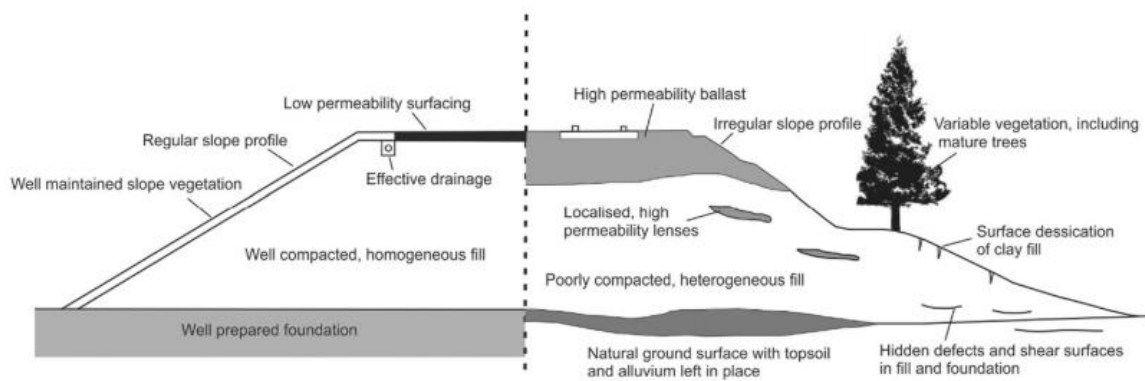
Embankment profile for a highway embankment (left) a railway embankment (right) (adapted from Perry et al., 2003).
